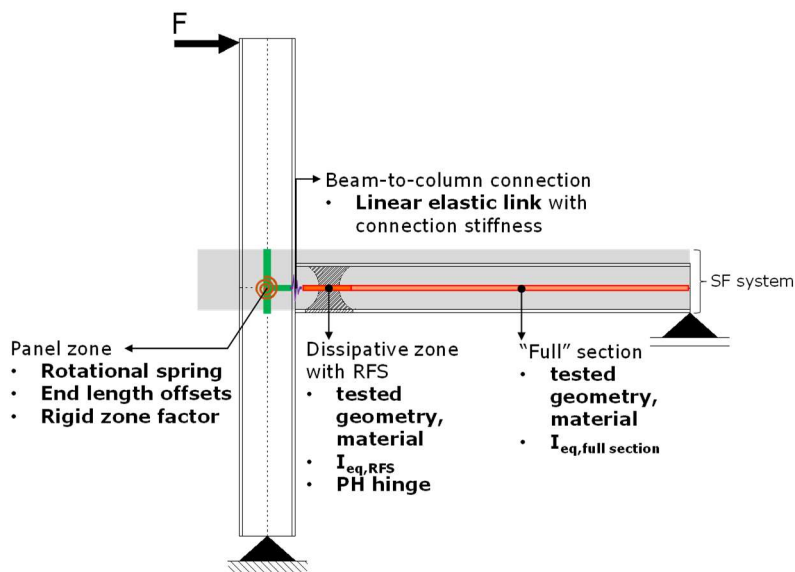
Modelling of SF beam-to-column joint and static scheme
